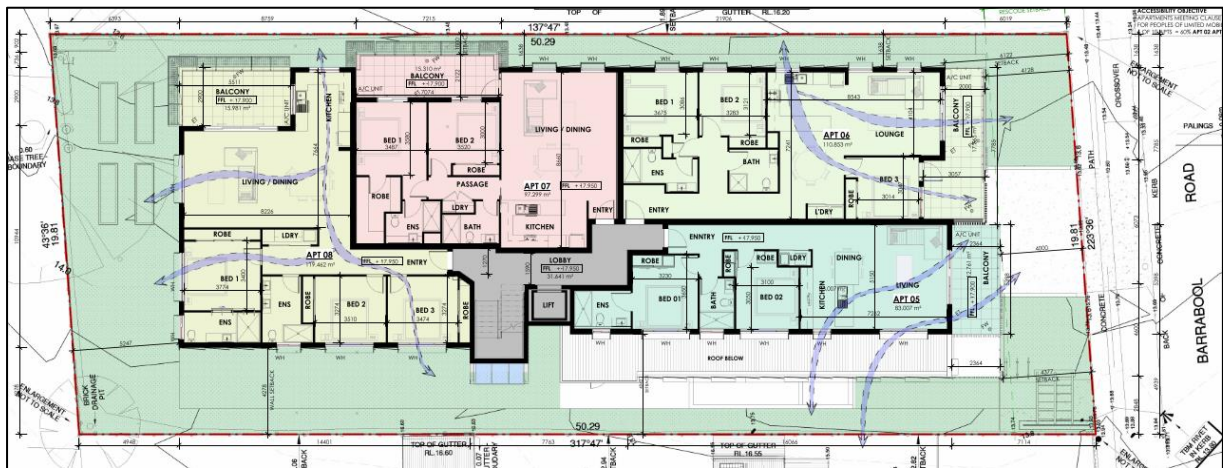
Mid (first) floor plan showing common area entry, apartment and private open space (balcony) layouts. Source: Application documents.
